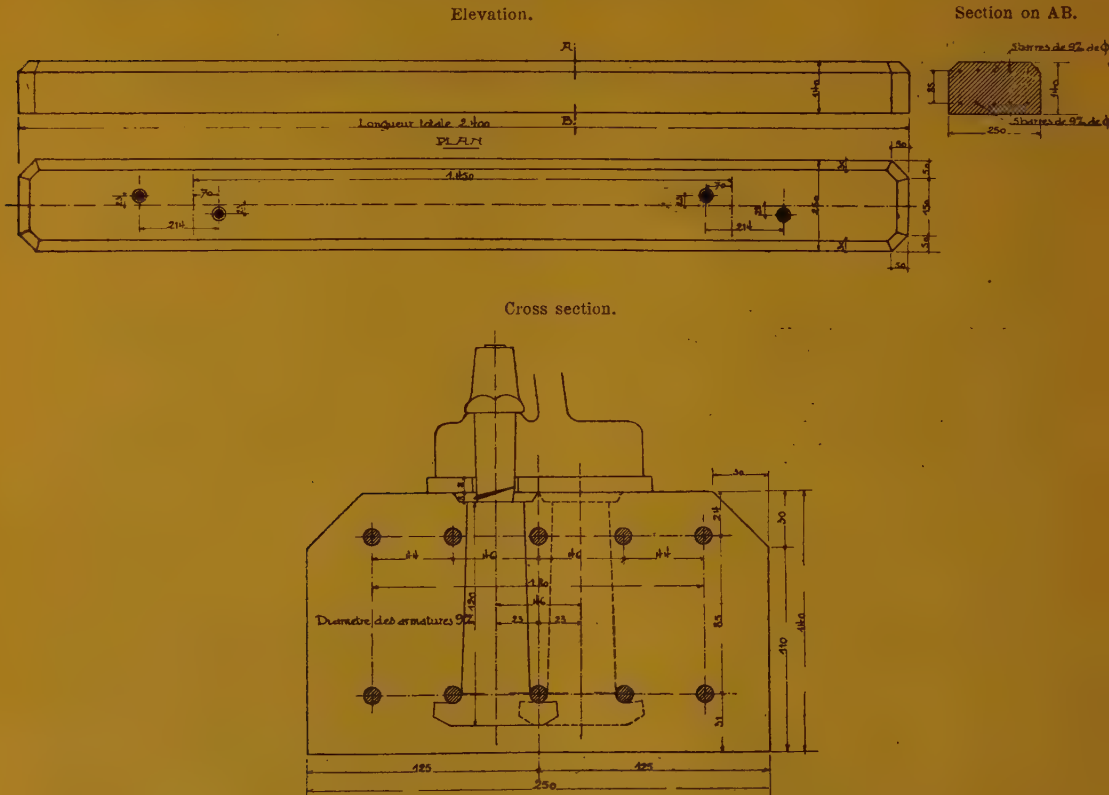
Orleans Railway. — Reinforced concrete sleeper with ordinary chairs.
